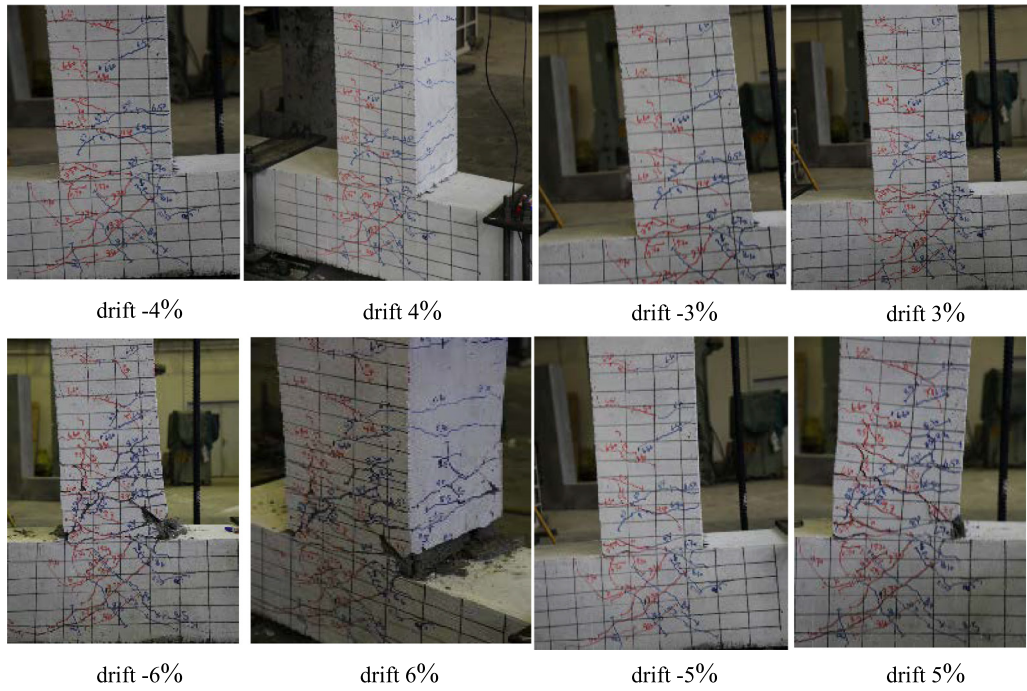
Crack propagation under loading in the specimen JH3-NC.
